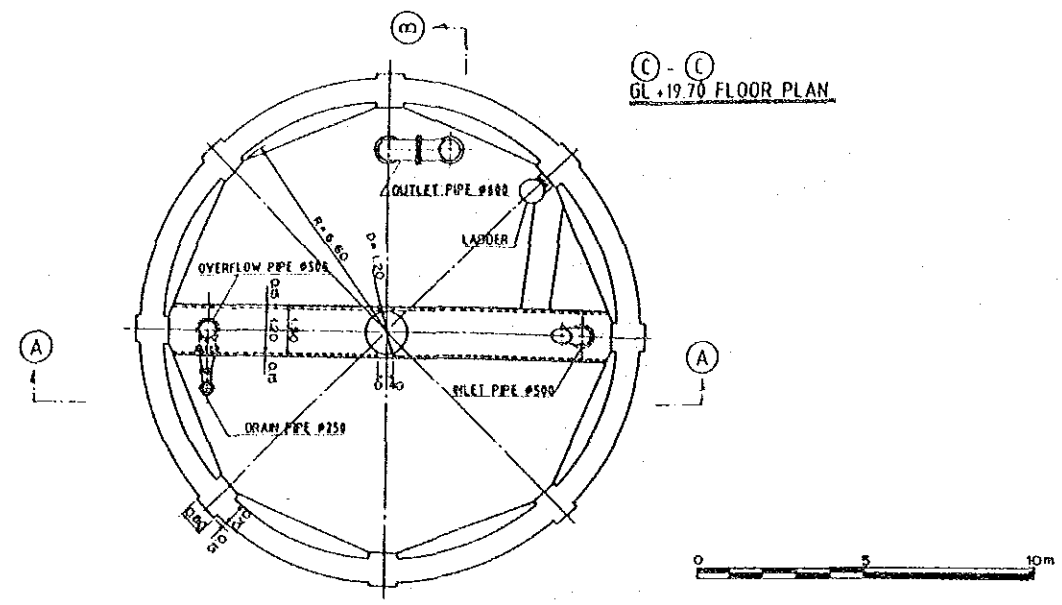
IMPROVEMENT DRAWING OF THE EXISTING ELEVATED TANK
